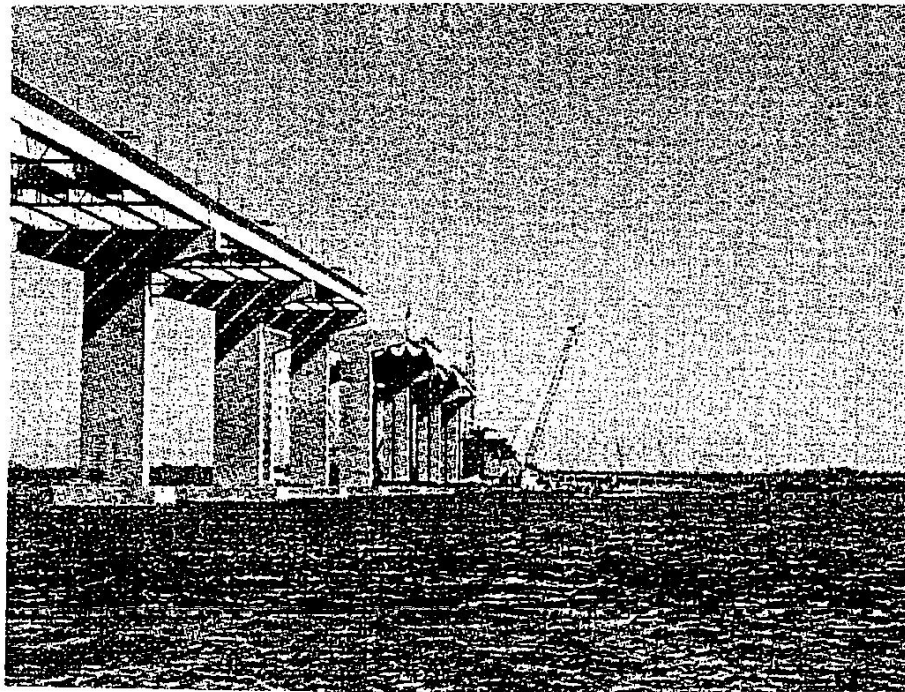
Photo looking west toward Biloxi of Hurricane Katrina damage to U.S. 90 Bridge over Biloxi Bay (Douglass et al, 2006).
